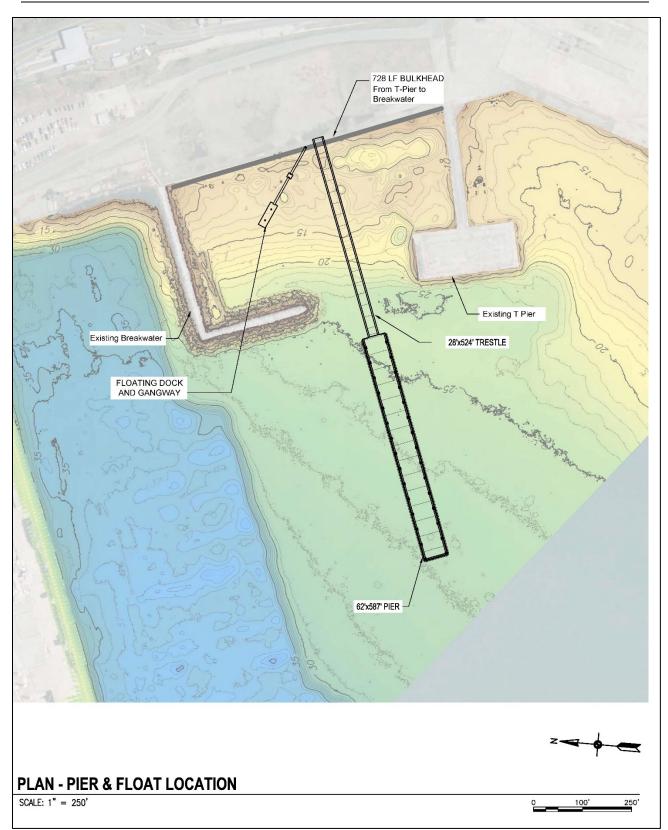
Plan View of Existing and Proposed Waterfront Facilities (Proposed Action)
